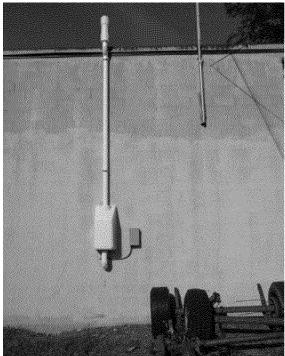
Paint Building – Vacuum blower and exhaust stack for system EP-2
